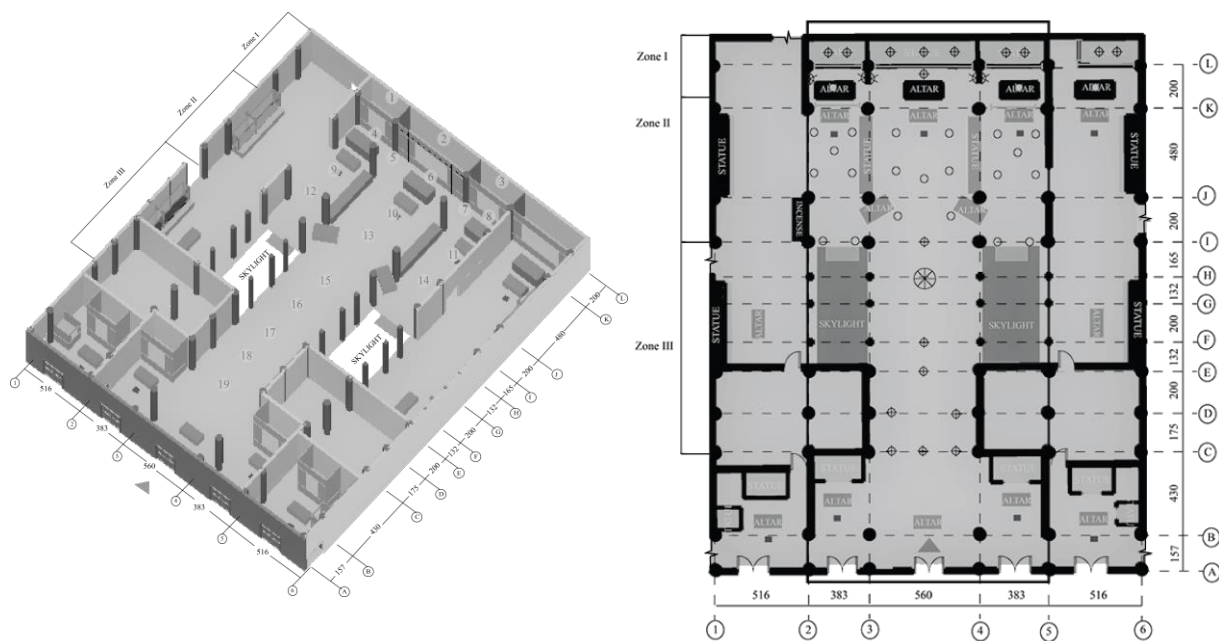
Plan and Isometric East Mountain Temple Worship Hall (Source: Fortuna, 2021)
